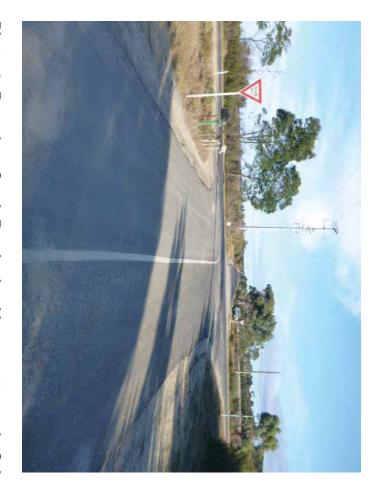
Road. Boundary Creek Road - Looking west towards Sale Seaspray
